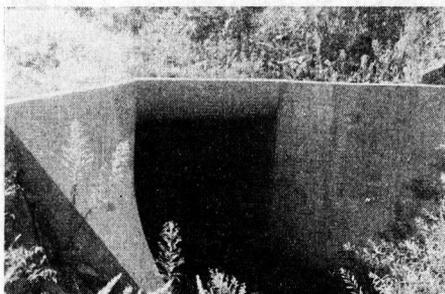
Warped-wing Headwall With Rounded-lip Crown at Entrance to Concrete Box Culvert.
